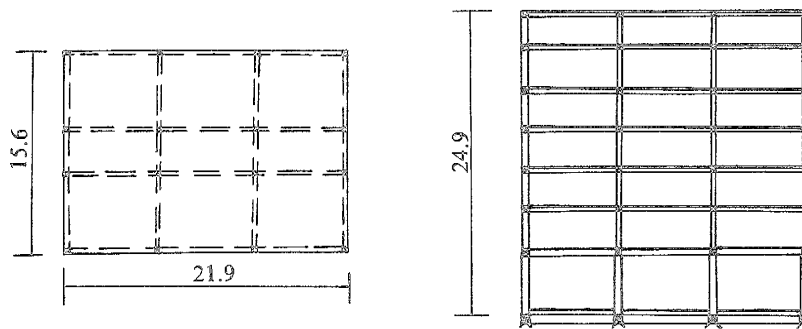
Plan and section of the base-isolated building in Xichang, China (Unit: m)
